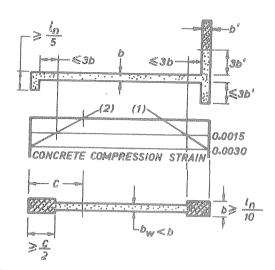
Parts of a Wall Section to be Considered for Instability and which Provides Lateral Support.
